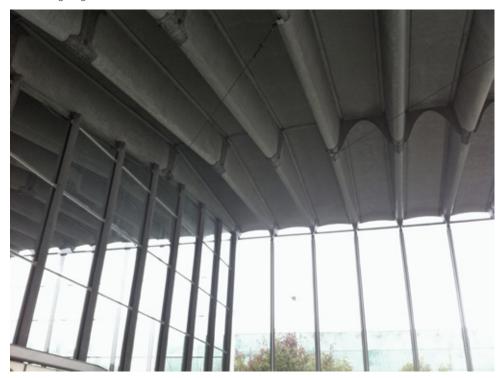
Cast aluminium brackets unite beams and extruded aluminium mullions
